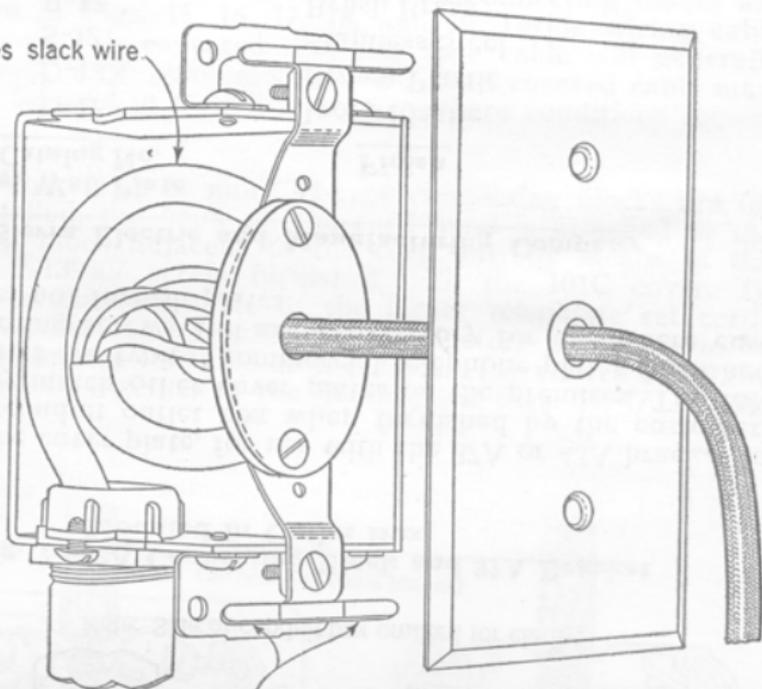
47B Connecting Blocks, Second Floor Apartments, etc.
